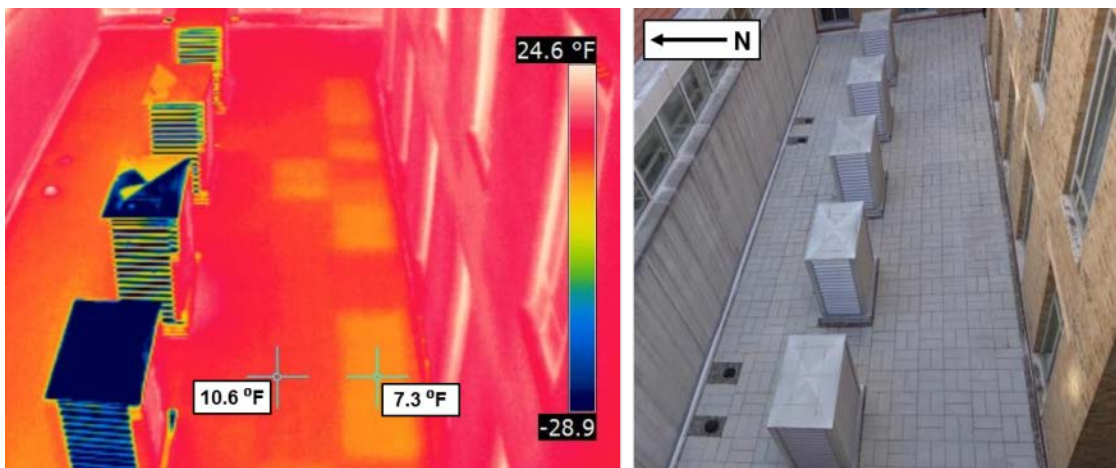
View of the VIP Coverage on the Second Floor Roof from the Fourth Floor West Roof
